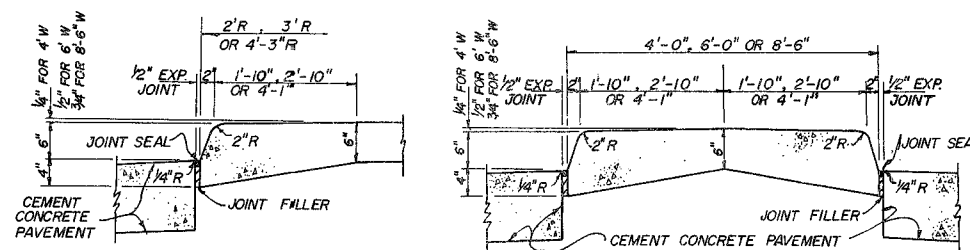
DETAILS OF TYPE III CONCRETE TRAFFIC SEPARATOR
